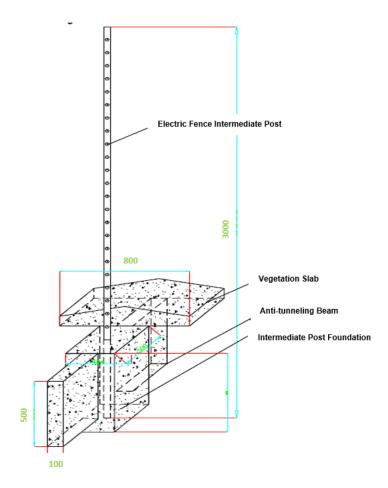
Vegetation Slab and Anti-tunnelling Beam General Arrangement
